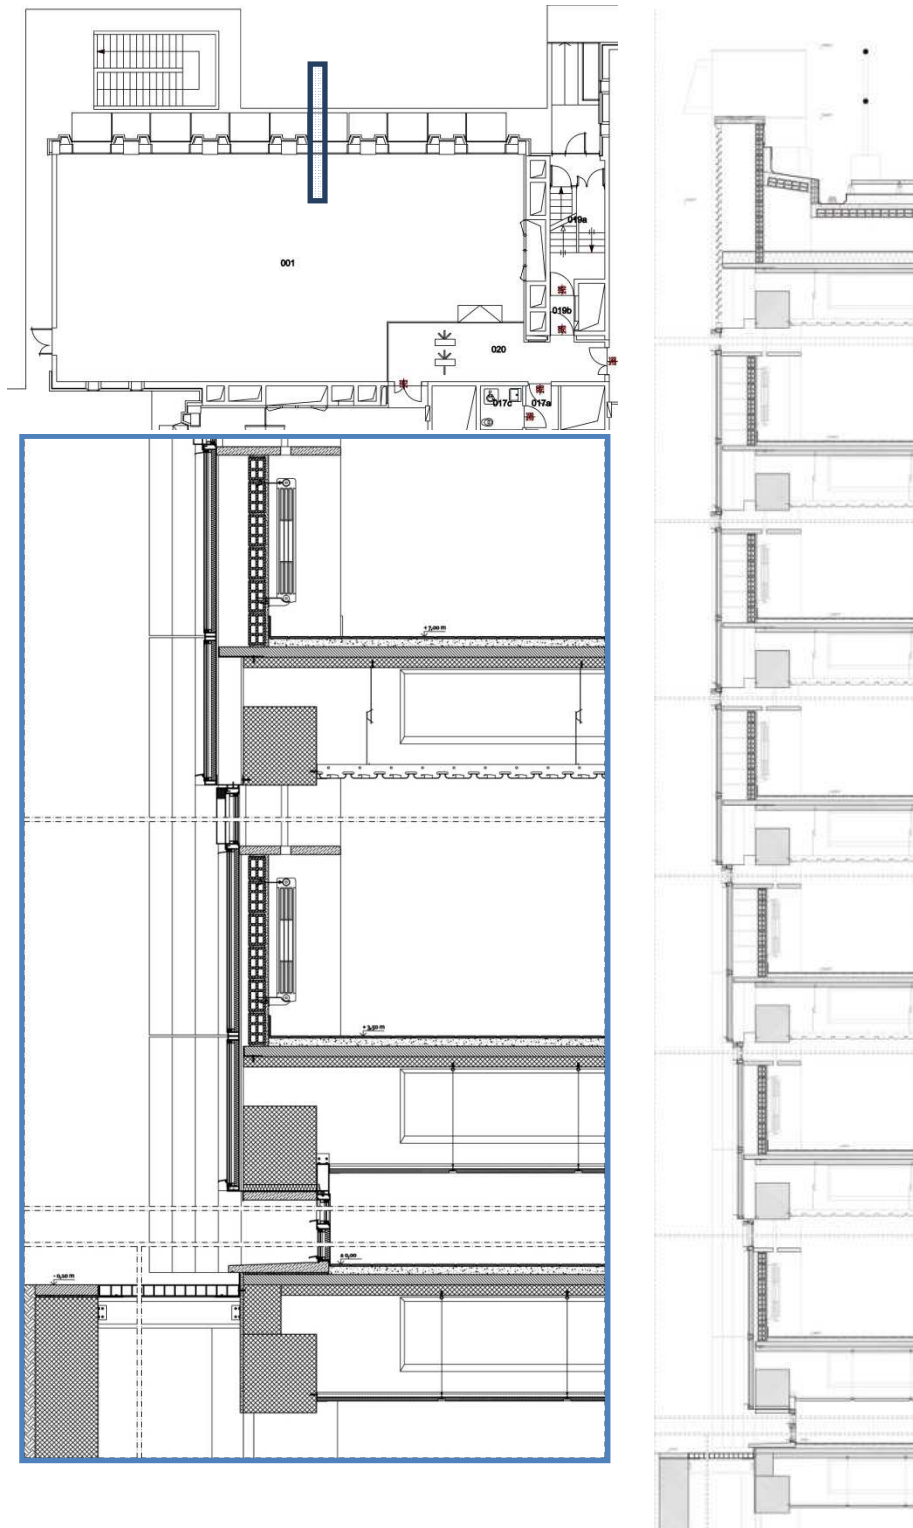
Stratigraphic analysis and identification on the drawing files carried on the vertical section for the detection of constructive components (pillars, slabs and structural beam elements)
